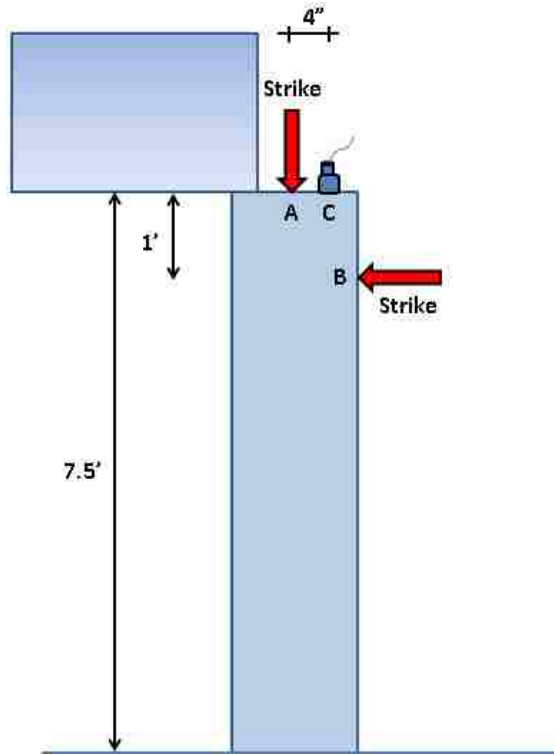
The Reinforced Concrete Column of Centennial Library on UNM Campus
